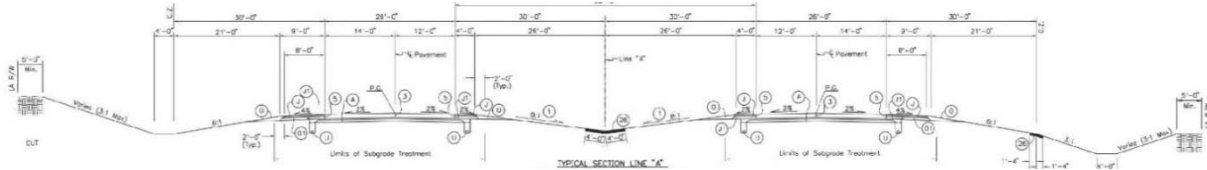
Typical Cross Section from Phase 2 plans, 2009 (R-30654)
